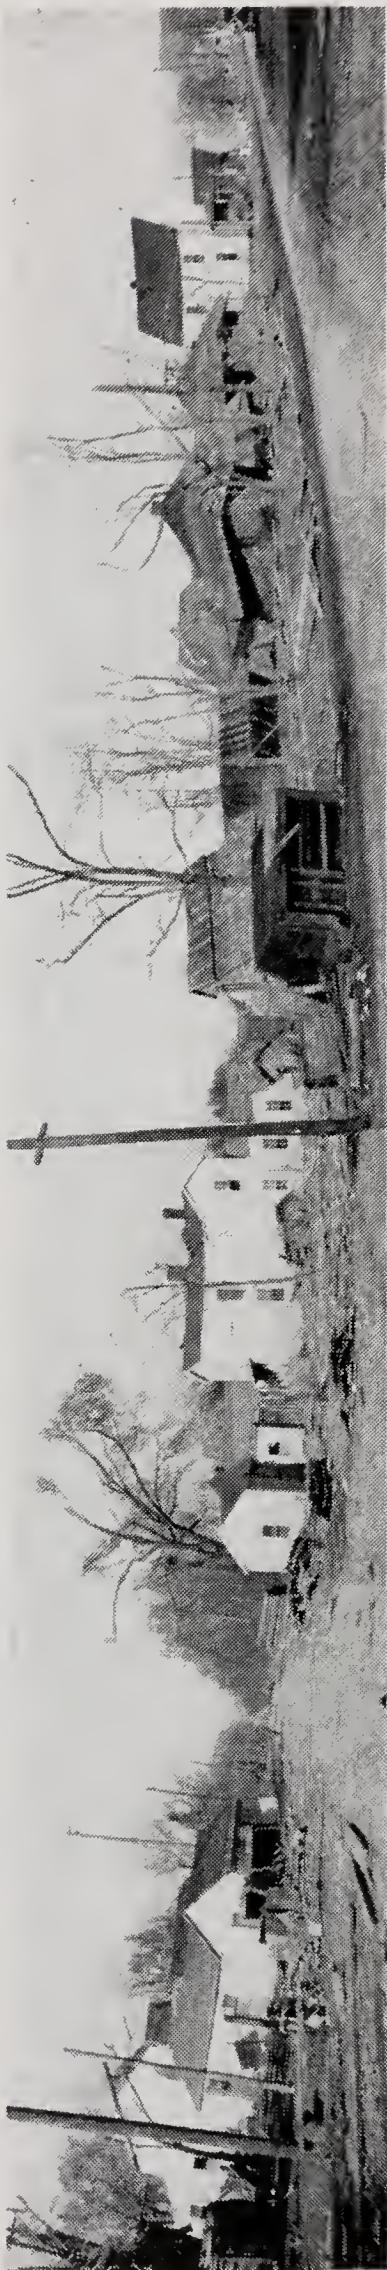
Shawneetown, Ill., March 17, 1937. View looking north and east from the intersection of 3rd South Cross St. and Market St. Damage to buildings caused by high water on the Ohio River of February 1937.
